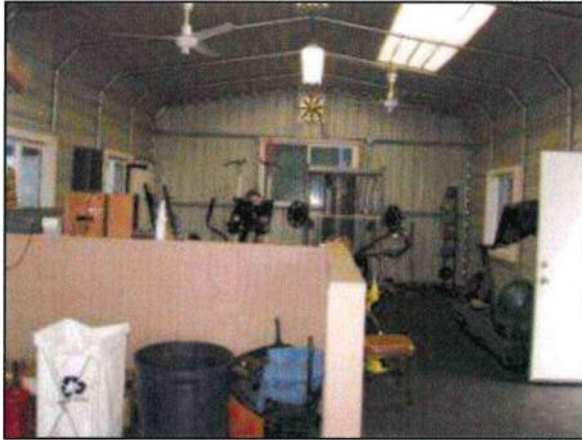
Fire Station #4 The steel metal building addition, which currently serves as the exercise room. The building has a rubber, impact-absorbing flooring laid directly onto the concrete slab.
